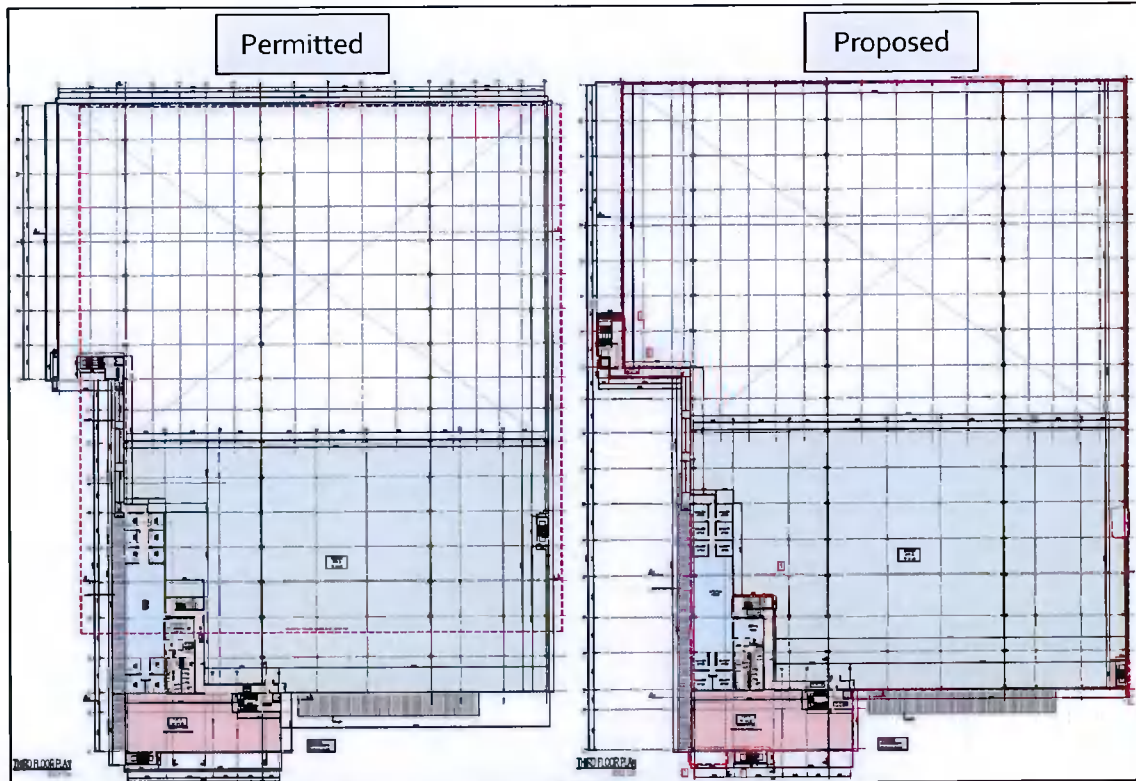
Permitted (SD21A/0200) and Proposed Third Floor Plans
